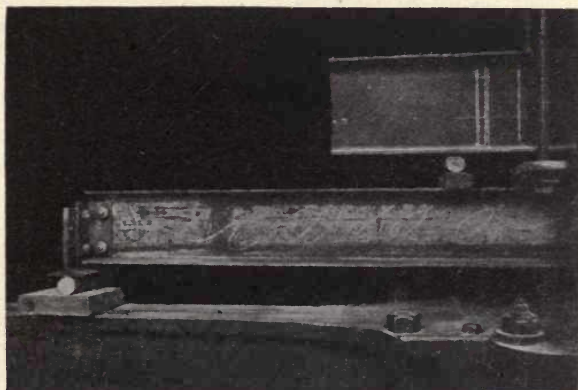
APPARATUS FOR TESTING I-BEAM WITH RESTRAINT AGAINST END TWISTING.
